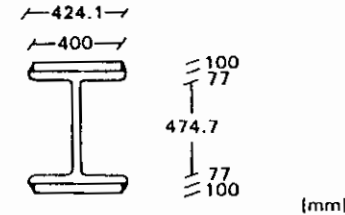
Column cross-section of Example 4.5, reinforced rolled section.
